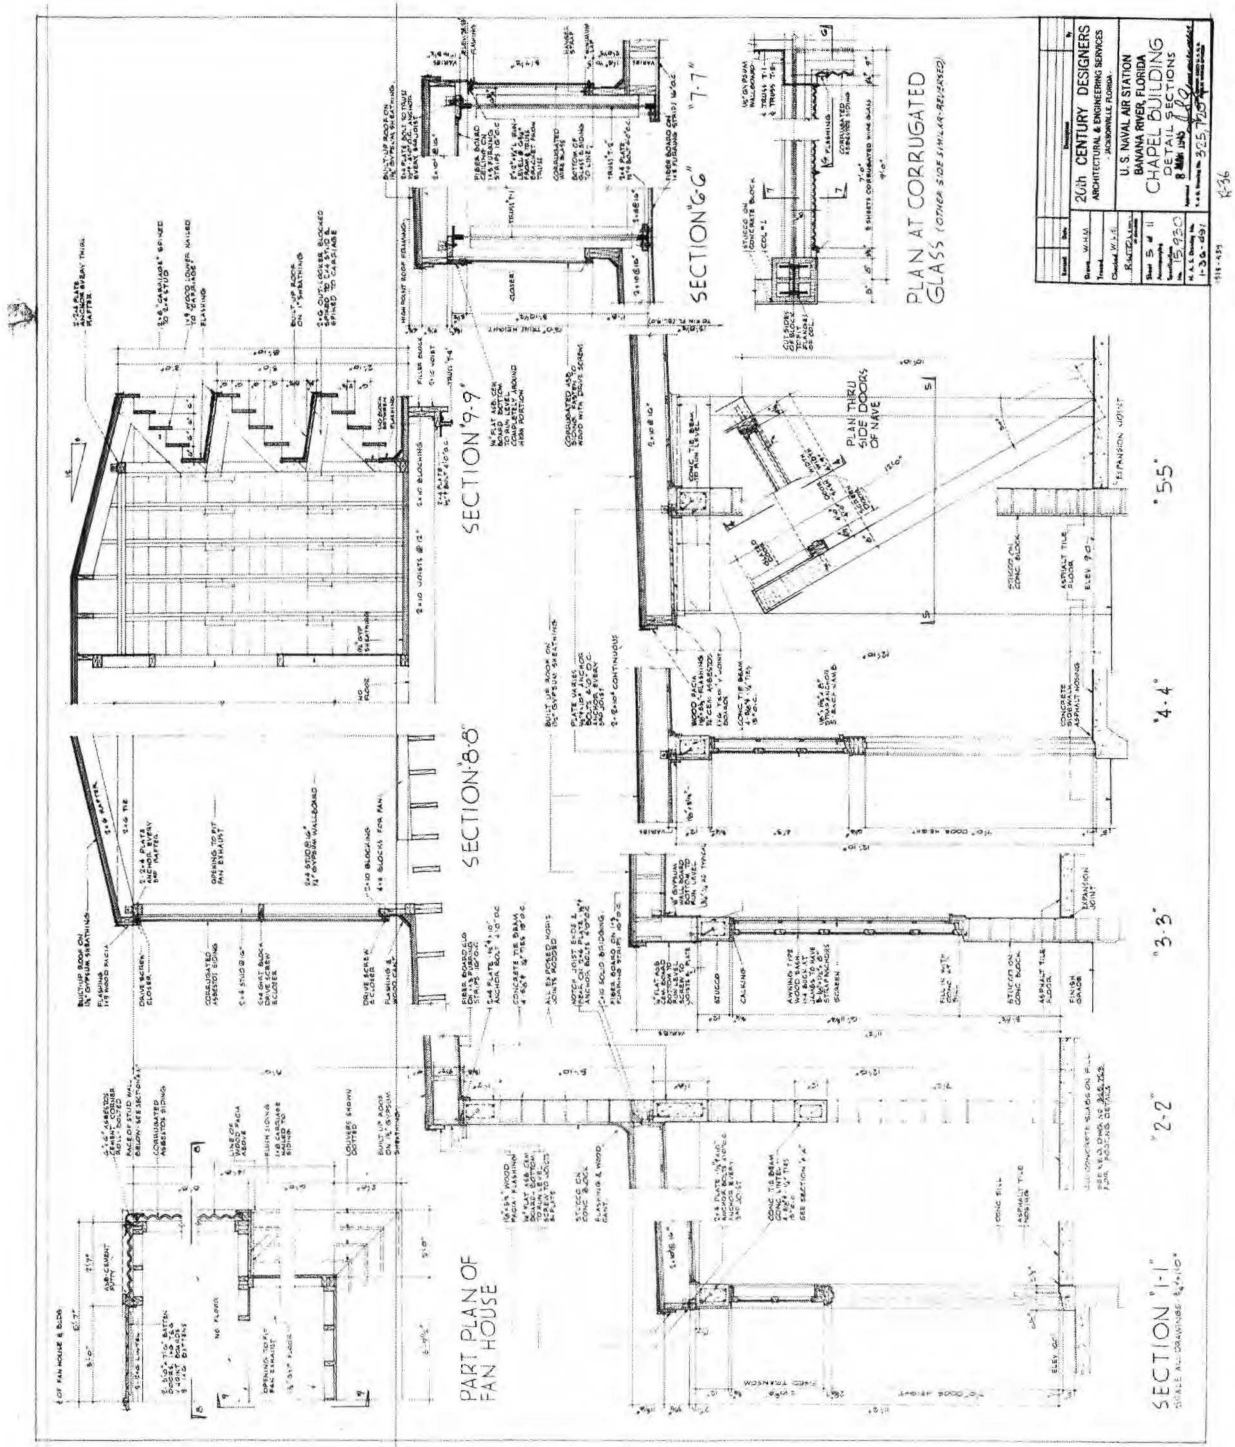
Detail Sections, Chapel Building, U.S. Naval Air Station Banana River, Florida, 8 March 1945.
